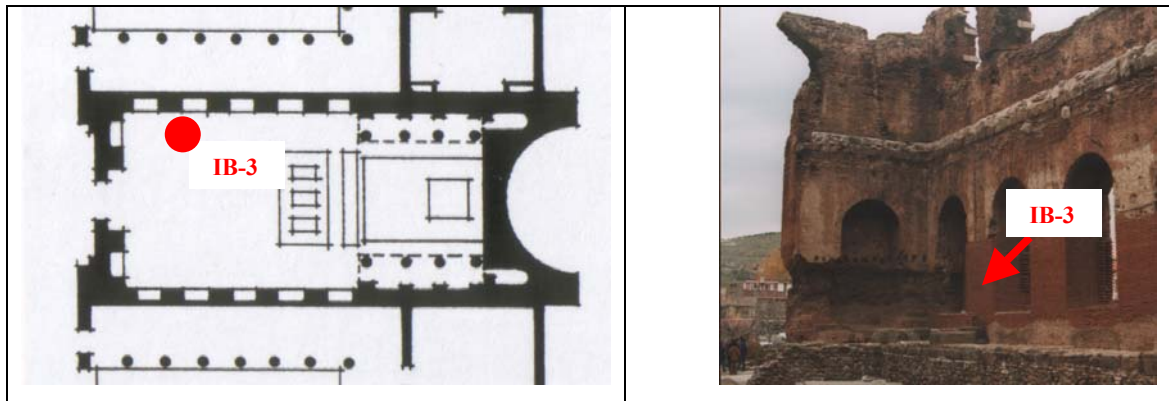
4. Plan of the Serapis Temple (Radt 2002) and view from the north-east elevations (2004) showing where intervention brick sample (IB-3) was collected.
